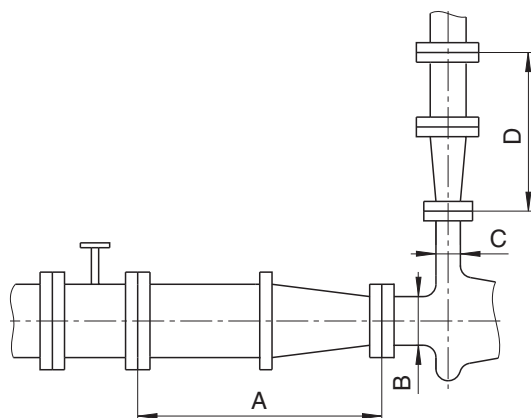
Straight pipe lengths in front and after the pumps (recommended)
